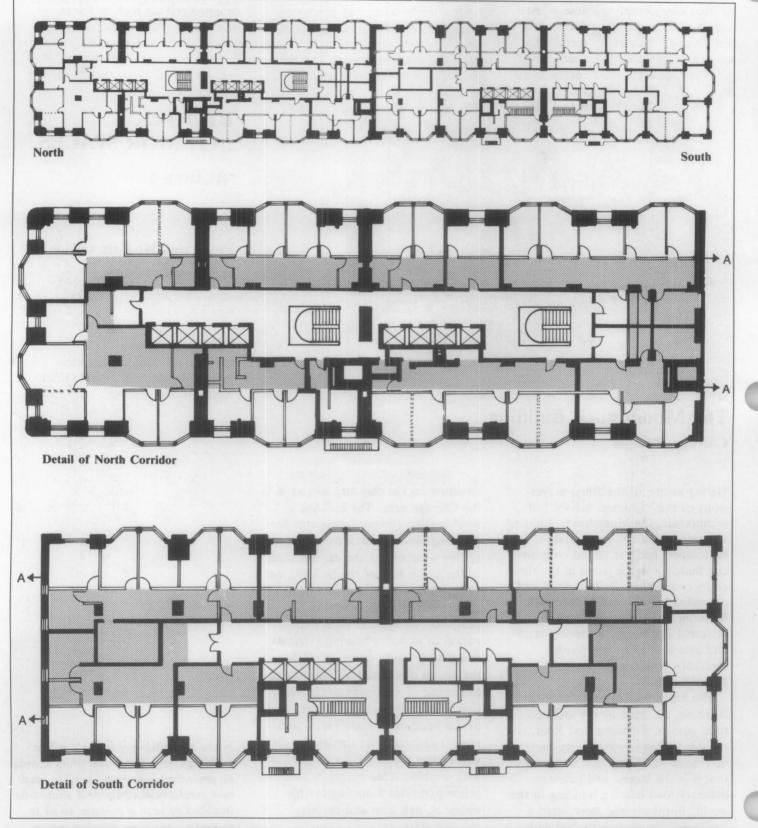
Both north and south building floor plan, showing double-loaded corridor system. Shaded area indicates dropped ceiling for mechanical chases in the non-public anterooms. Public corridors and private offices retain full ceiling height. Drawing: Neal Vogel
